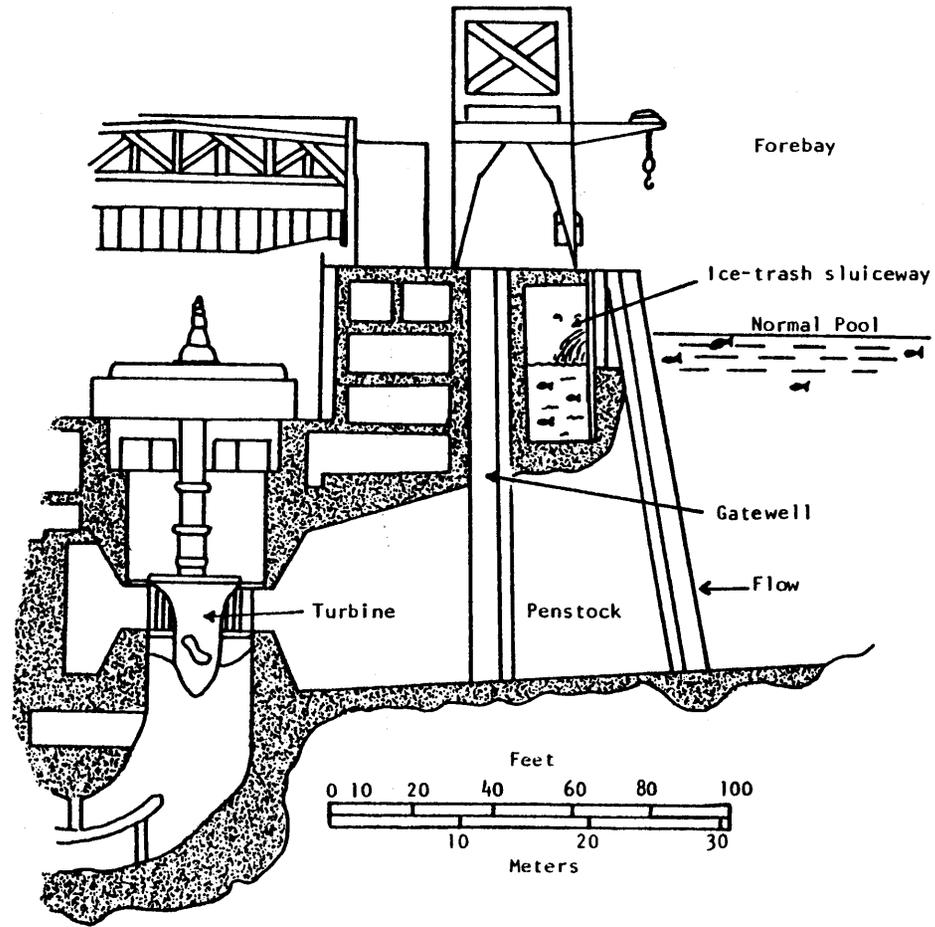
Cross section of a Columbia River dam with a sluiceway.
